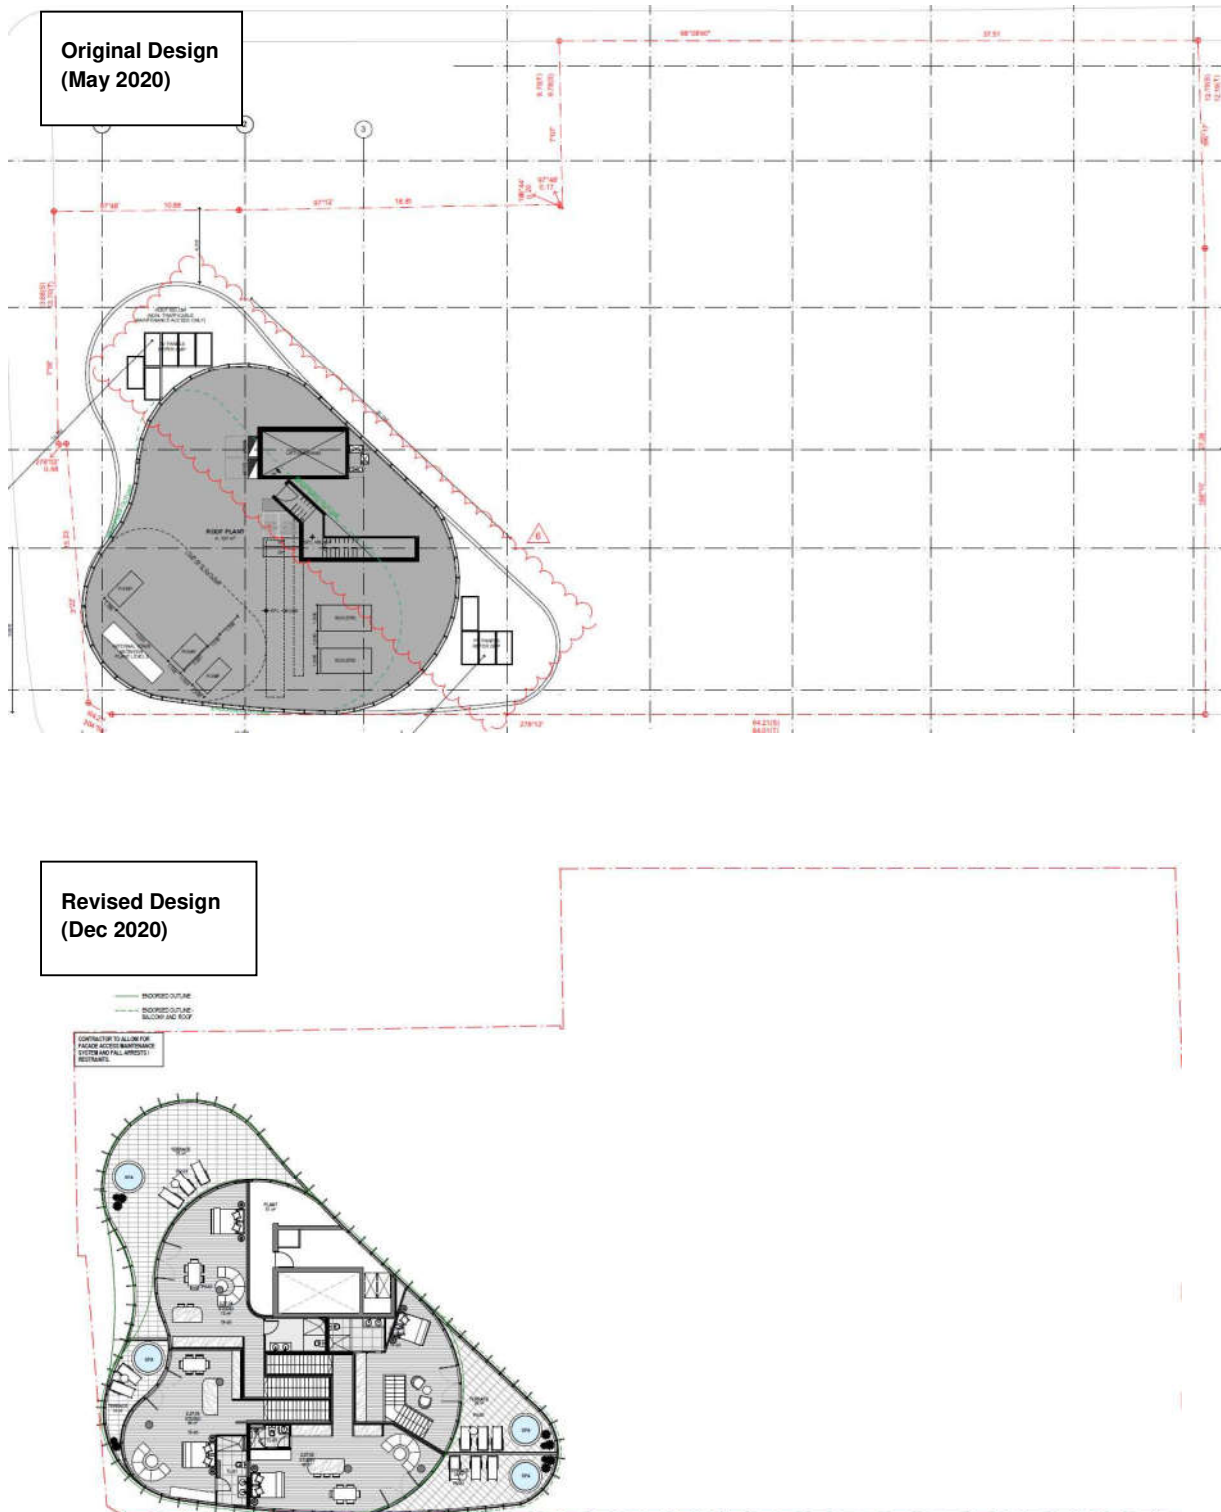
Level 27 plans for the development at One Wellington, St Kilda – comparison between revised design and original design tested in the wind tunnel
